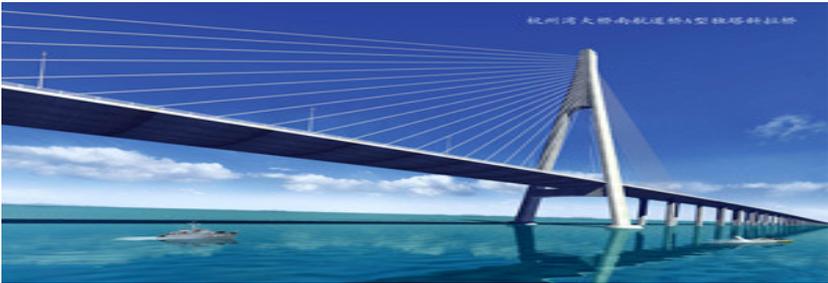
Hangzhou Bay Sea-Crossing Bridge
